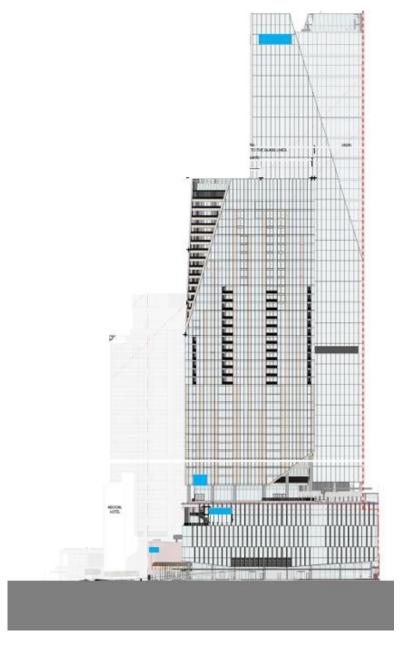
West elevation (at Lower Hobson Street) with signage zones highlighted.
